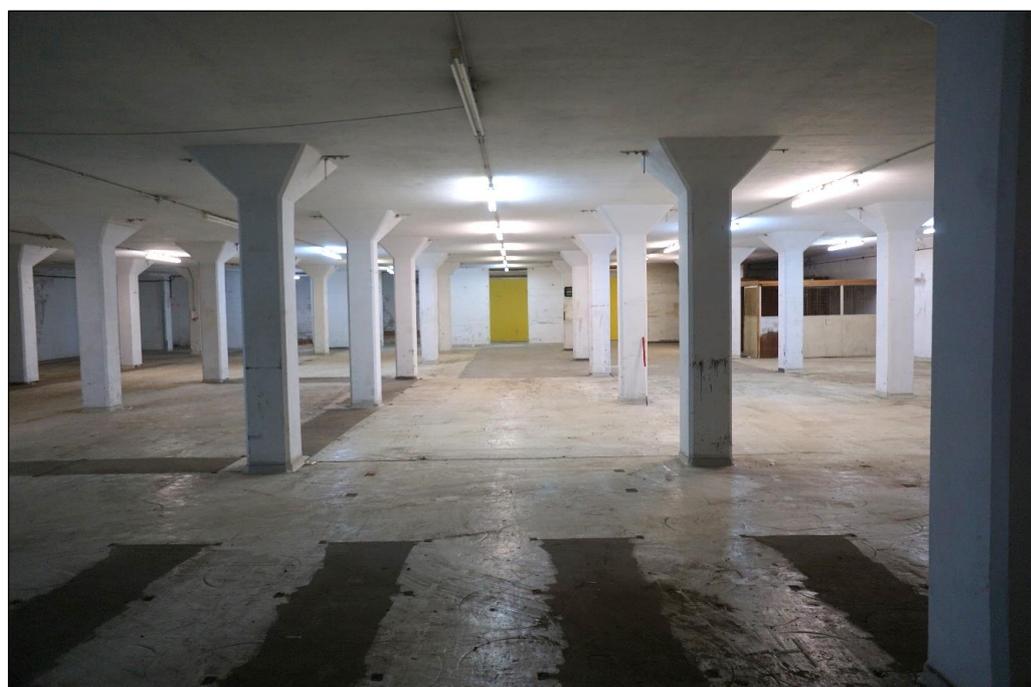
Looking west along the storage bay towards the platform opening, with markings on the floor visible in the foreground
